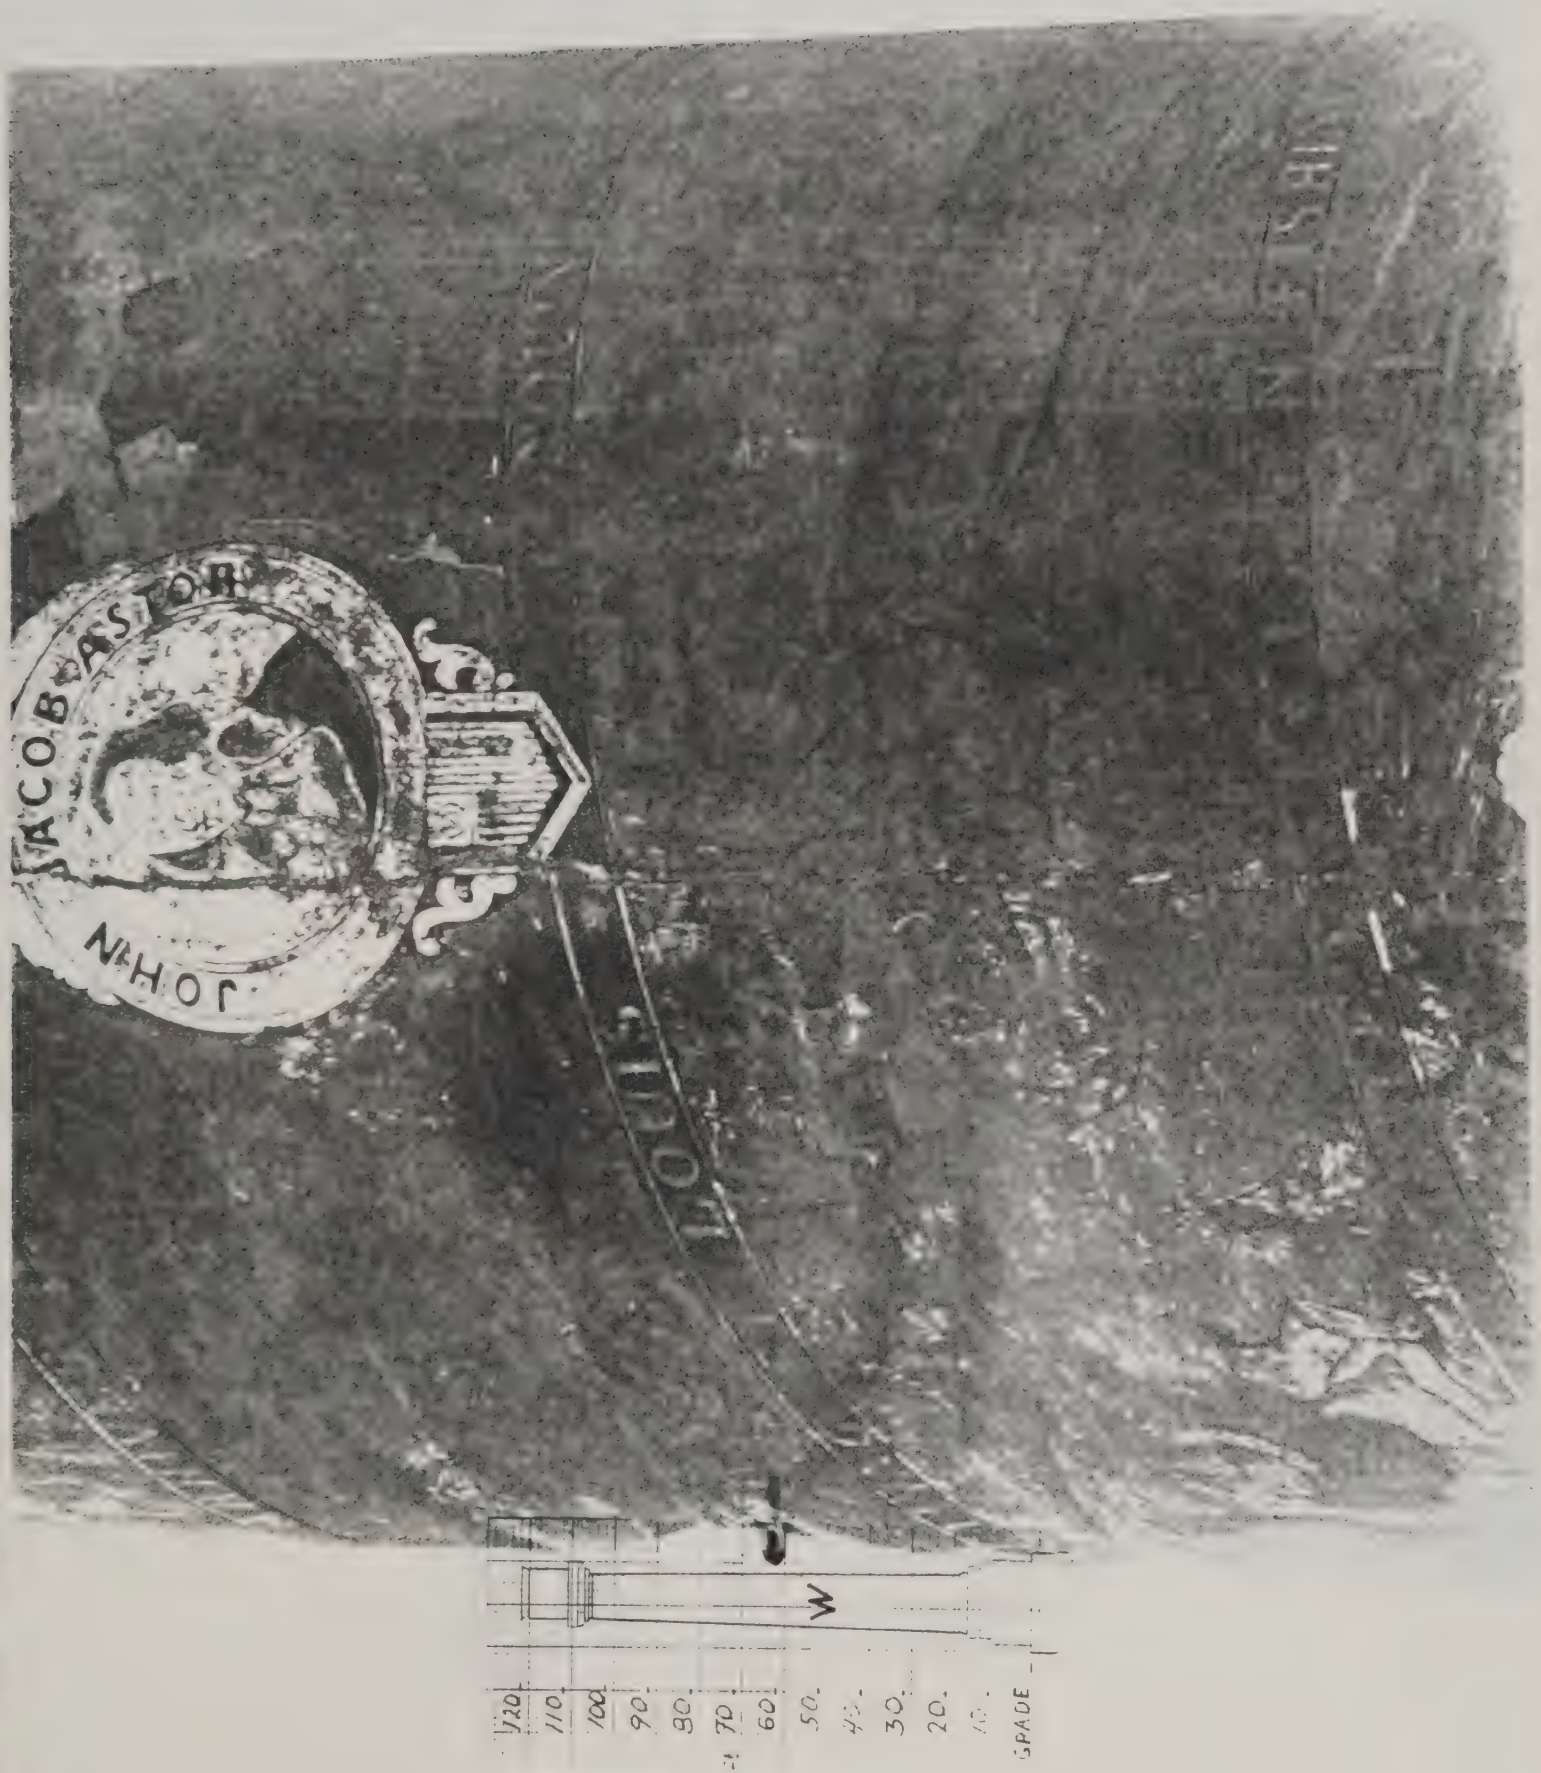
Photo Astoria Column West Face Section-JAN 1989
